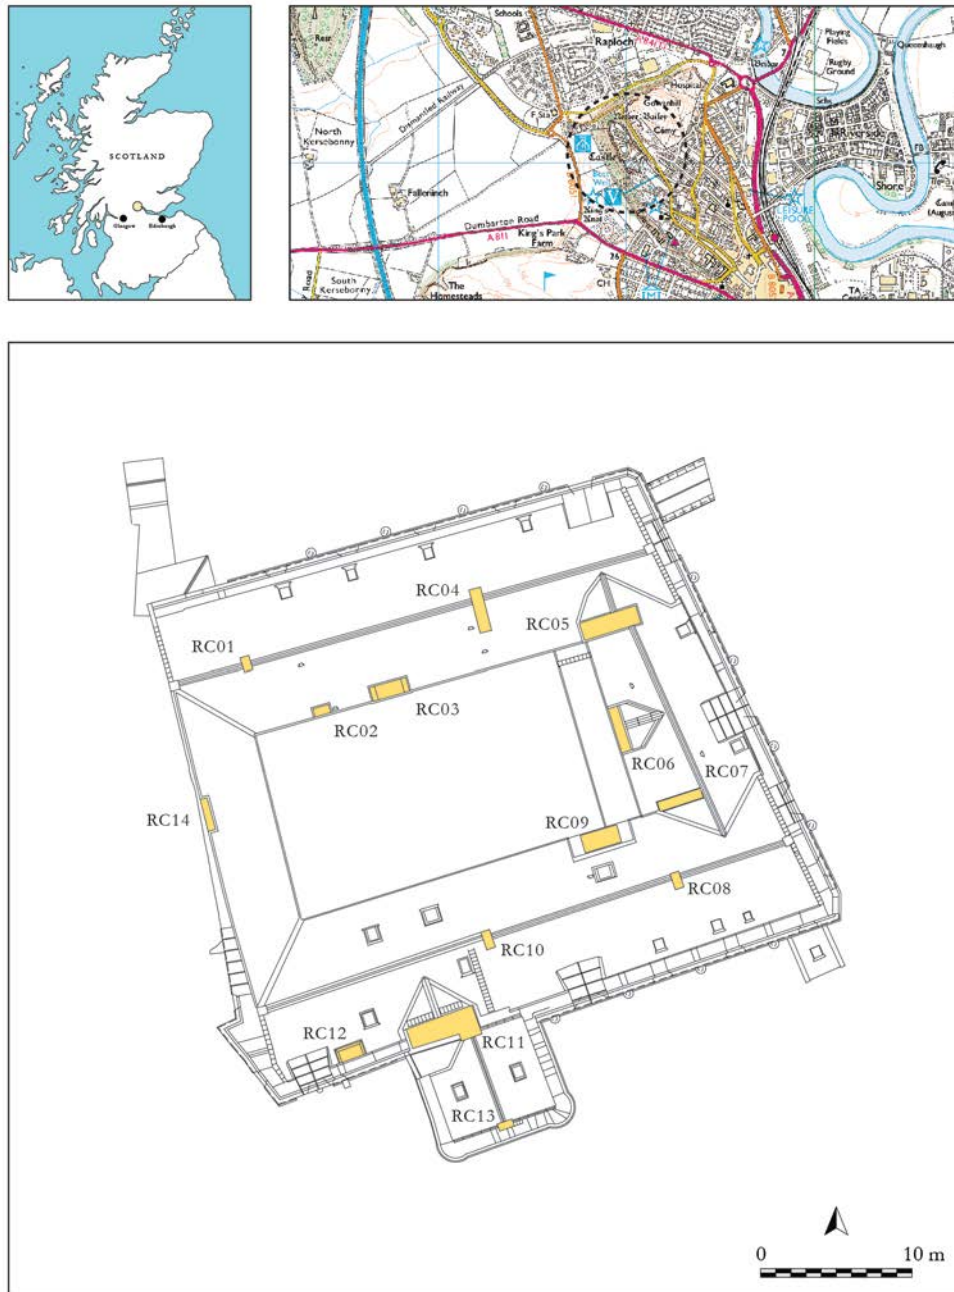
Plan showing the locations of the chimneys discussed in this report.
